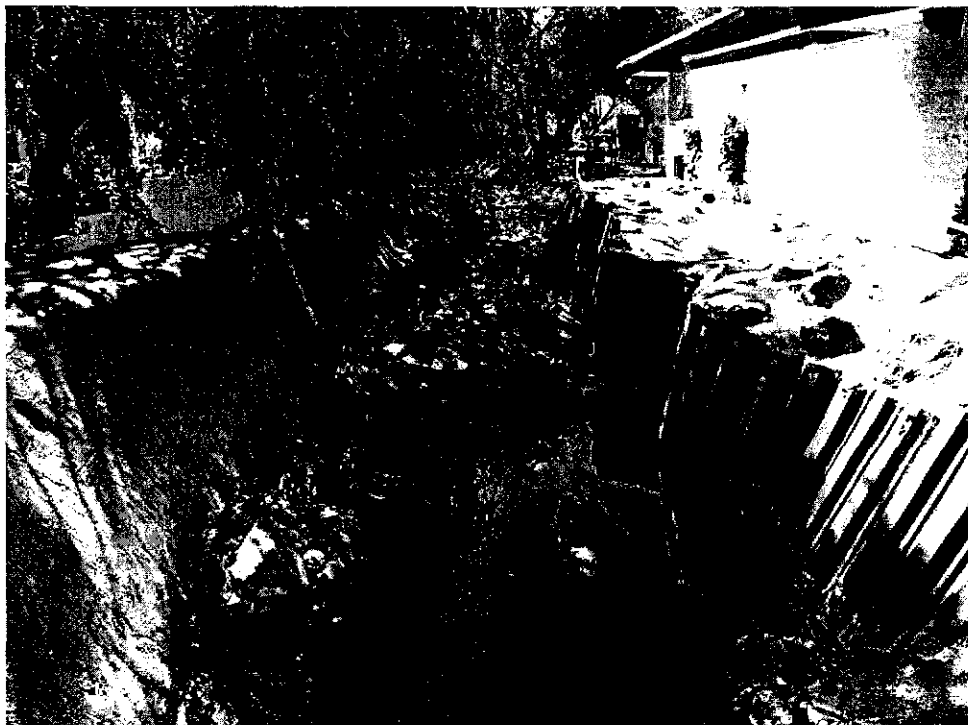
Looking downstream from Sun Valley north bridge (natural channel with sheet-pile and Gunite bank stabilization).
